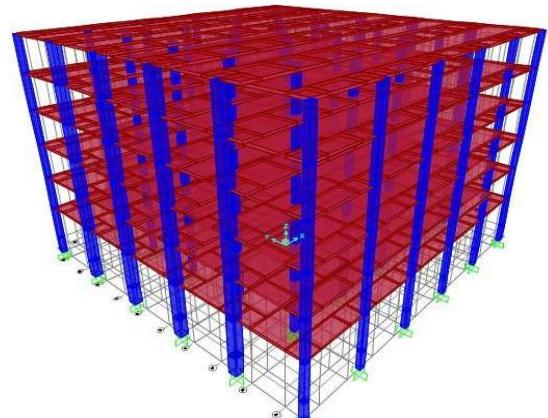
3D Model of flat slab building using U-Boot Beton (SAP-2000 Window)
